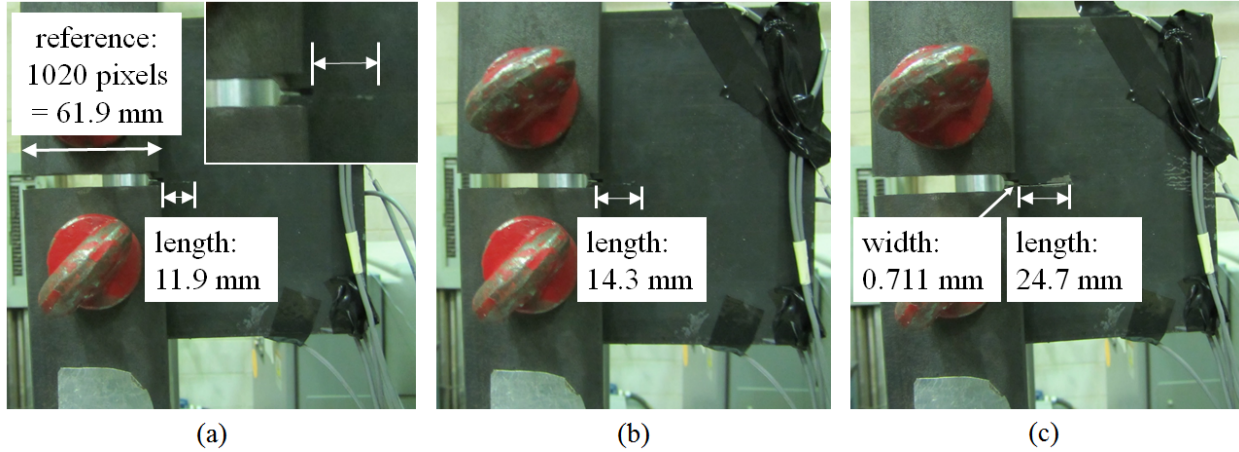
Typical fatigue crack growth during tests: (a) initiation (blowup of the crack at the top right corner); (b) crack growth; and (c) crack expanded at MTS stop.
